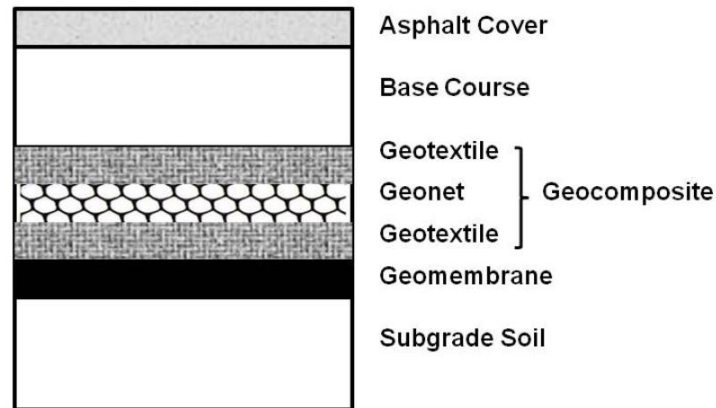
Modified moisture barrier used in pavement subgrade (Ahmed, 2017).
